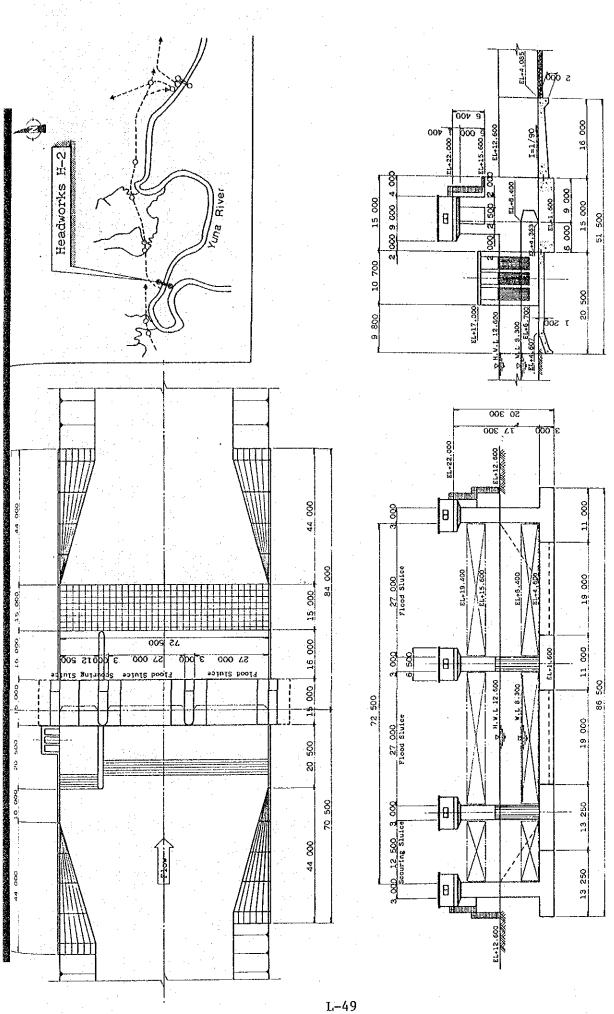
GENERAL PLAN OF PROPÓSAL H-2
